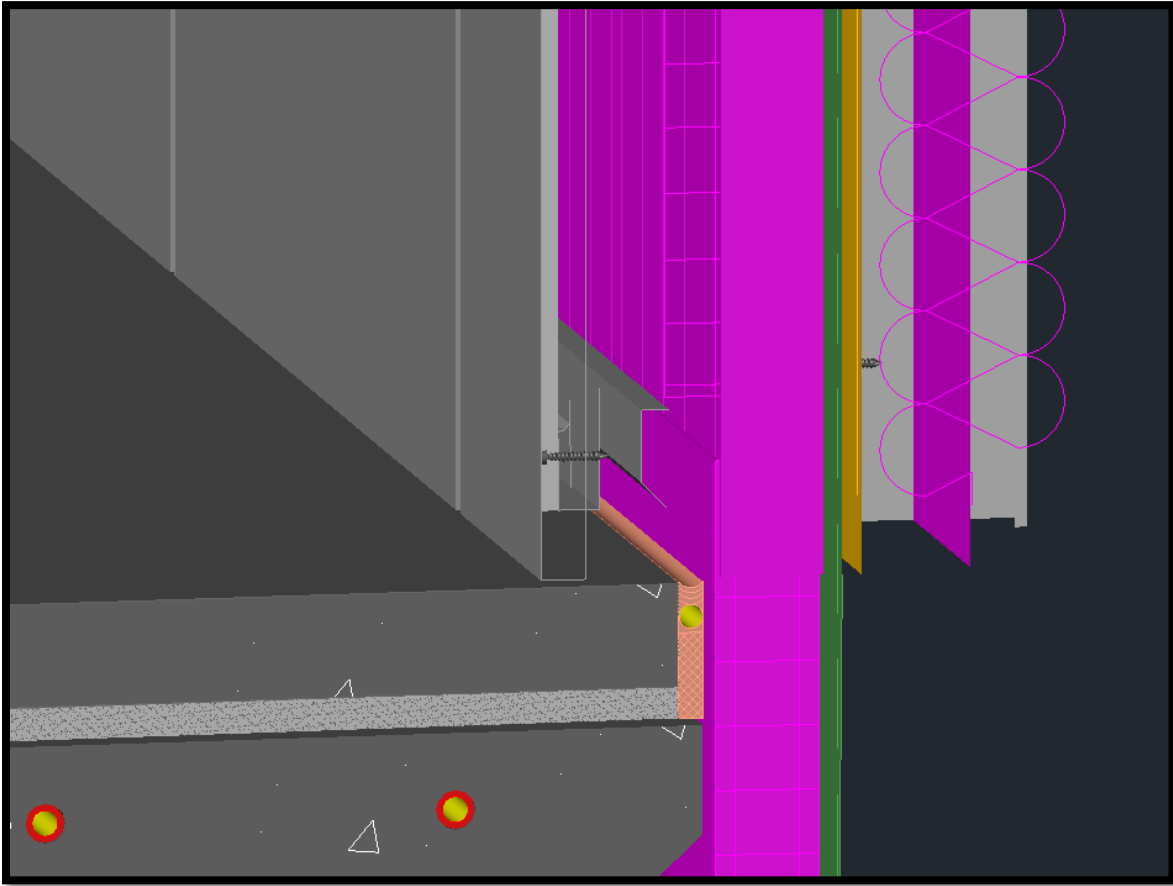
A close up image of the virtual mockup showing how the concrete paver, embedded hydrant radiant heating pipes, insulation, sealants, and water proofing are connected.
